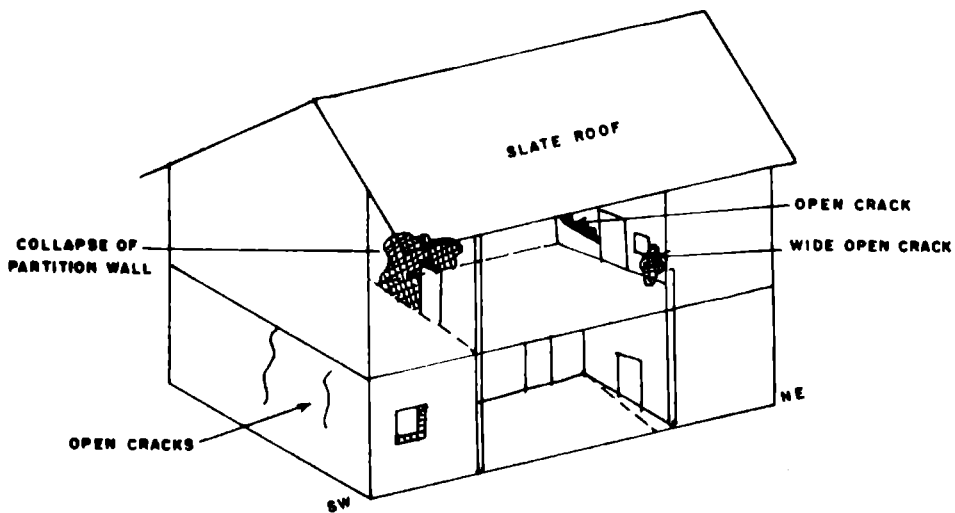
DAMAGE OF KUTCHHA HOUSE - AGONDA
